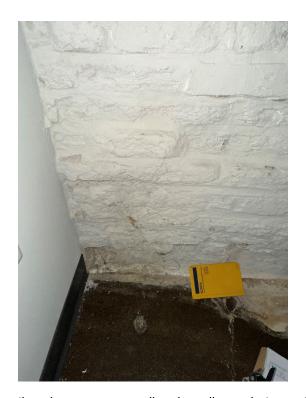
Deterioration along masonry wall and small gaps between the slab and wall
